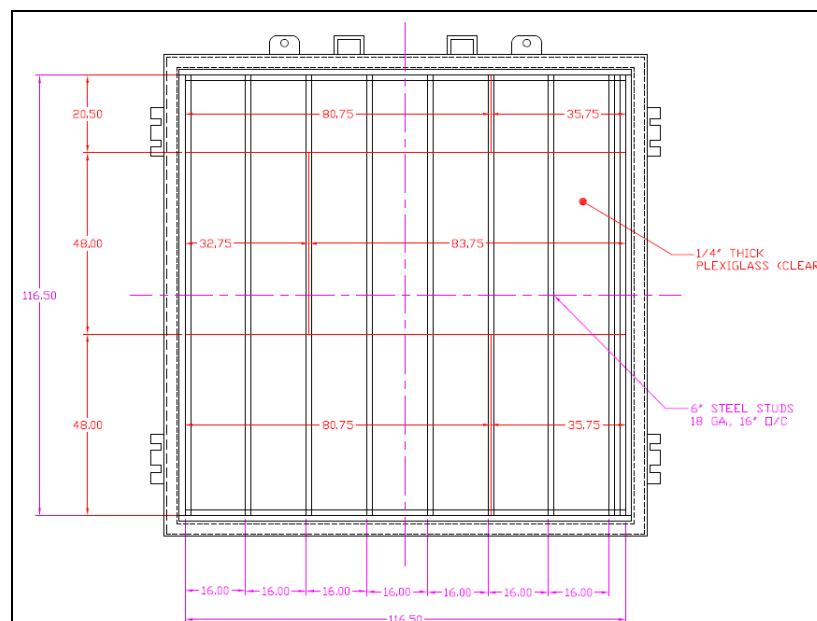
Back-up Test Wall Framing Construction (dimensions in inches)
